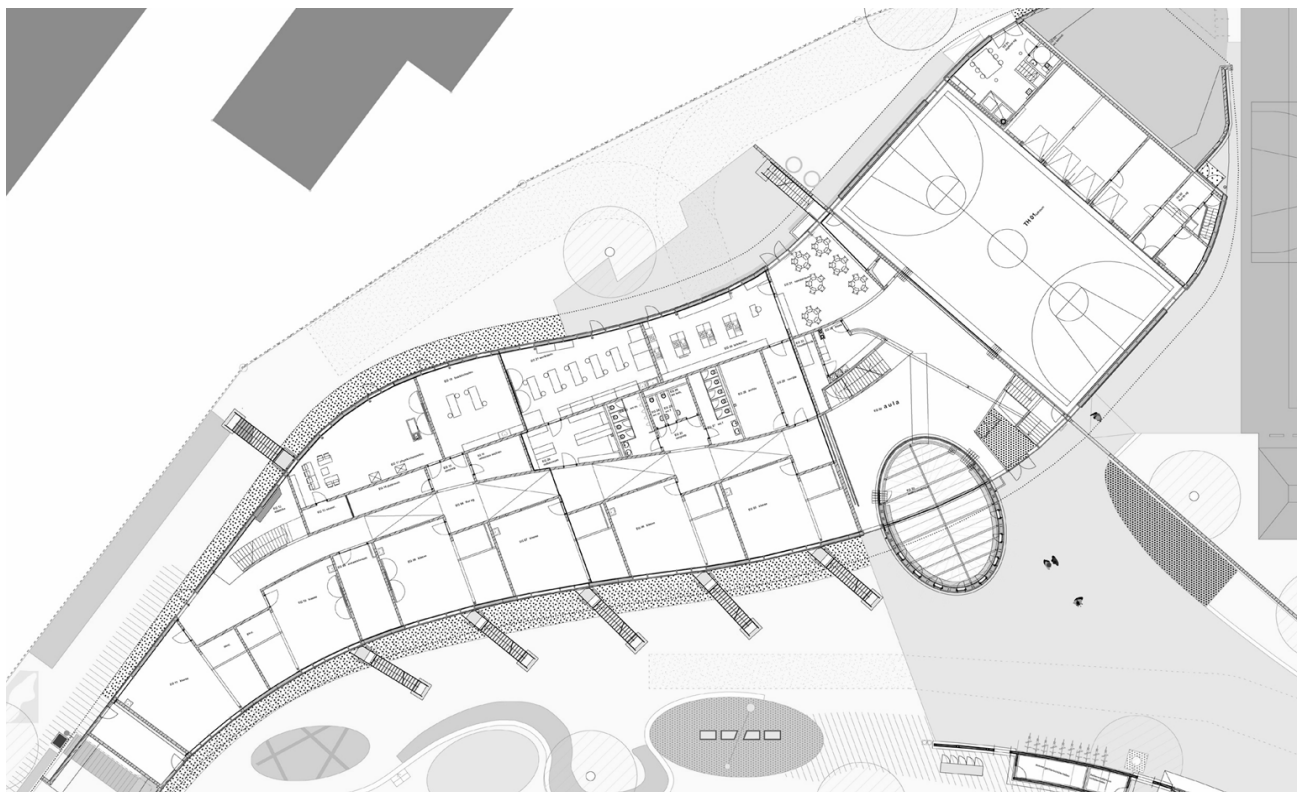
Floor plan of the ground floor of the Montessori School in Aufkirchen (AW Vallentin)
